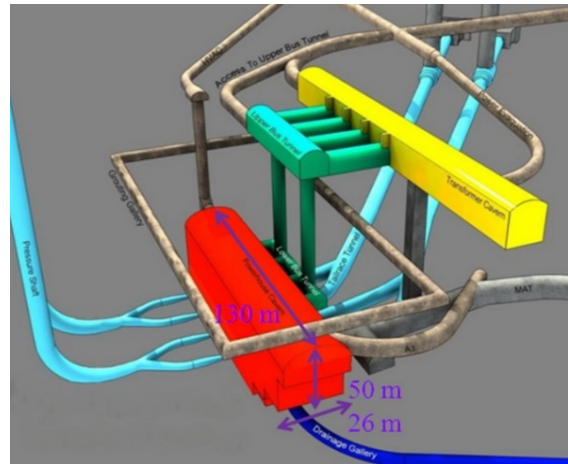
Layout of cavern of pumped-storage power plant project of Rudbar, Lorestan dam.
